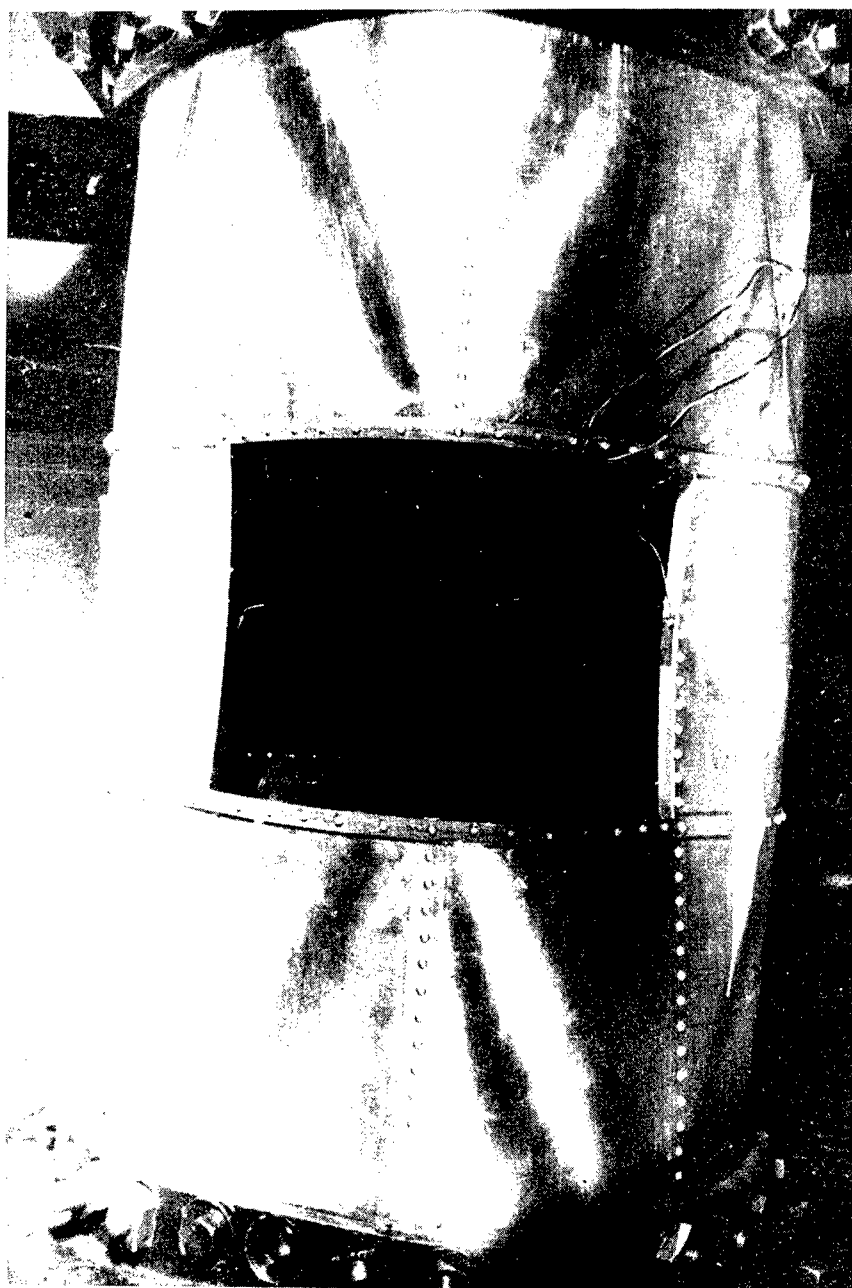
Bottom view of PIBAL cylinder 82 after buckling.
